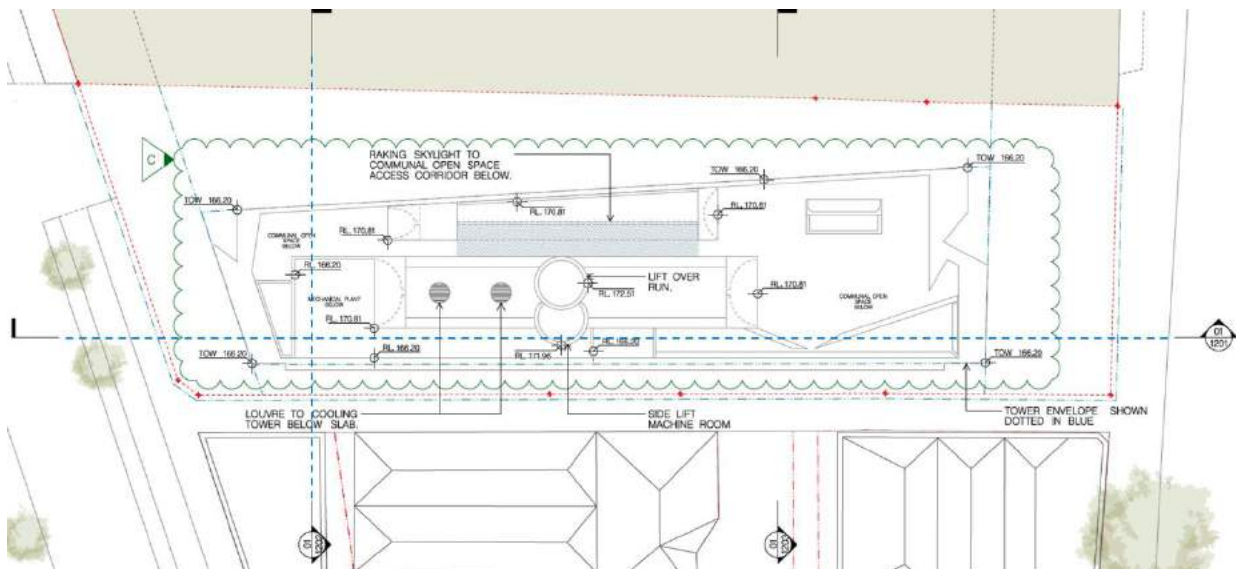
Roof plan with the long cross-section location emphasised in dotted blue
